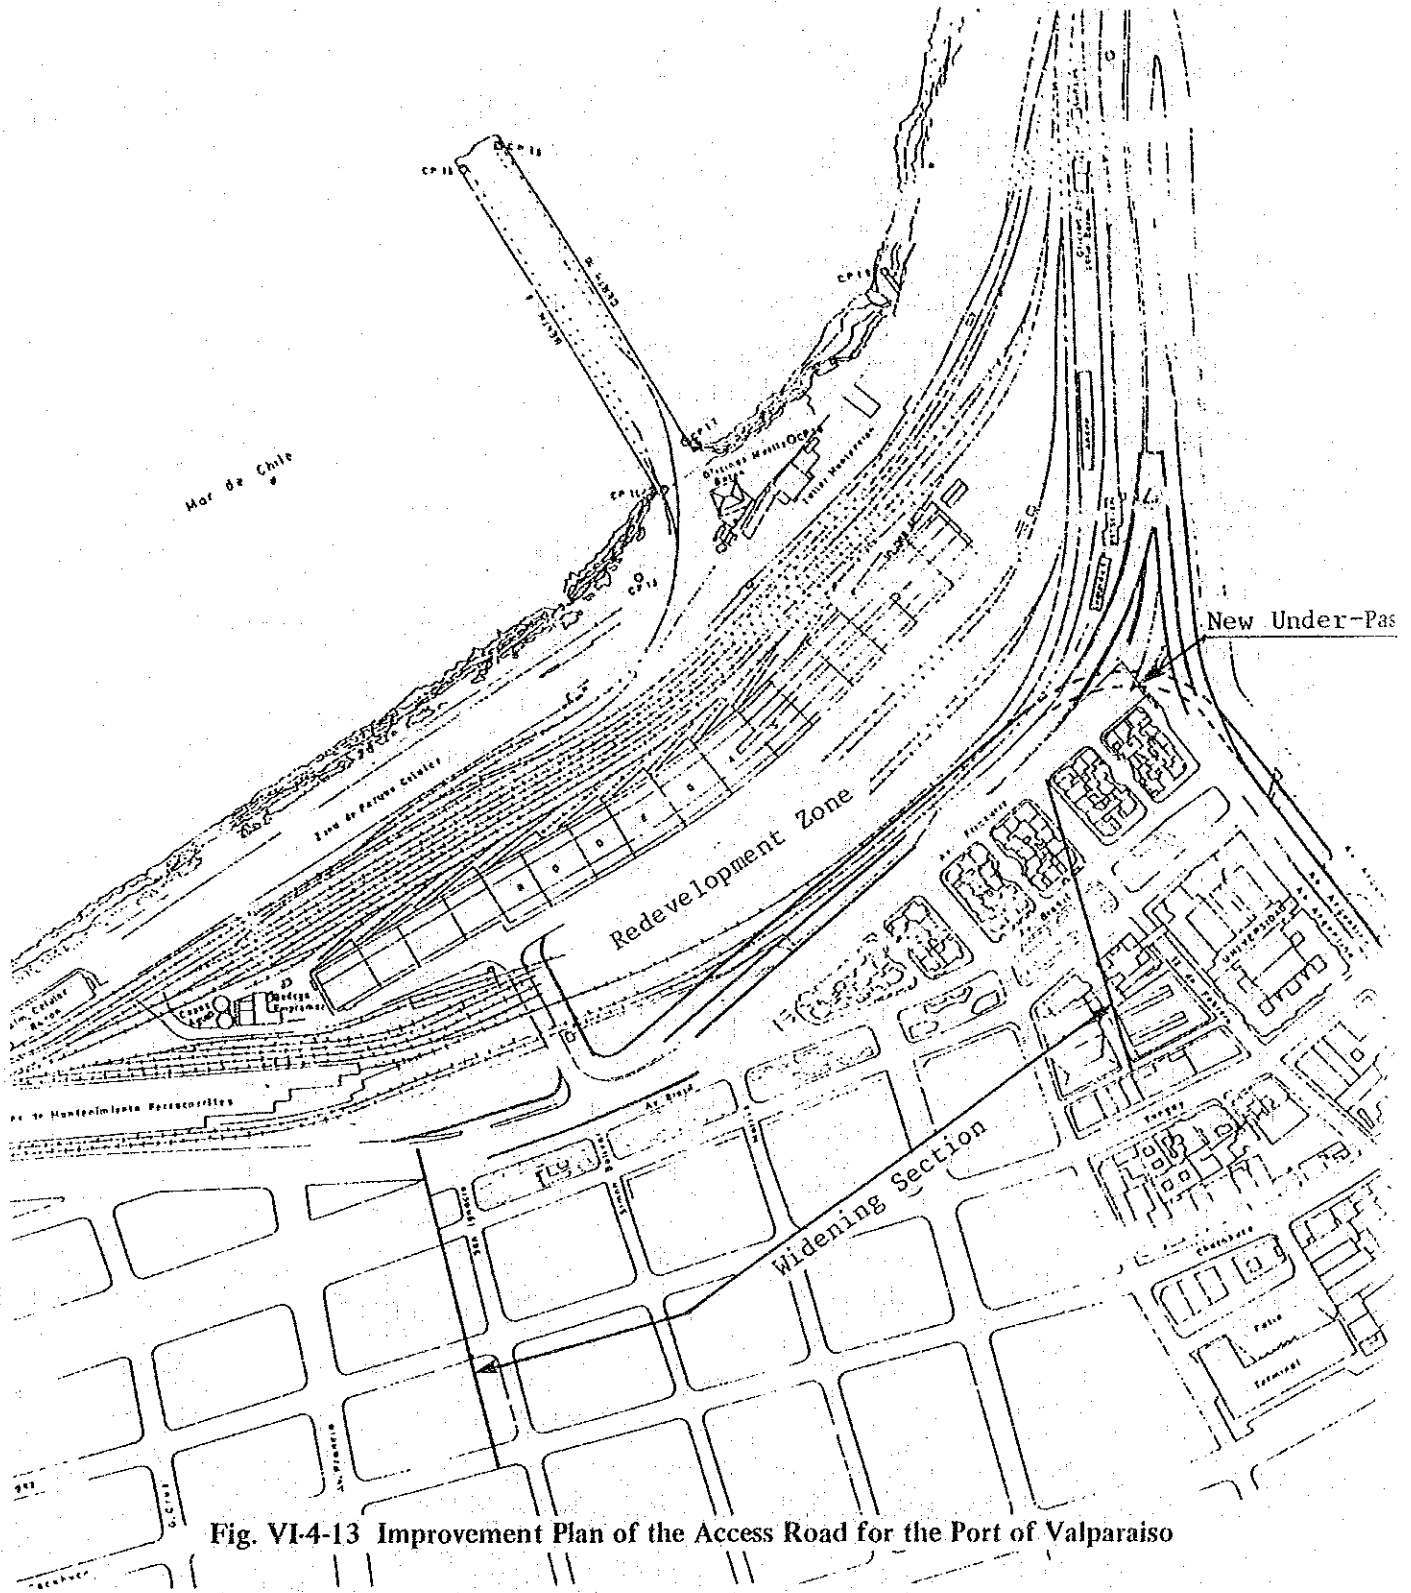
Improvement Plan of the Access Road for the Port of Valparaíso
